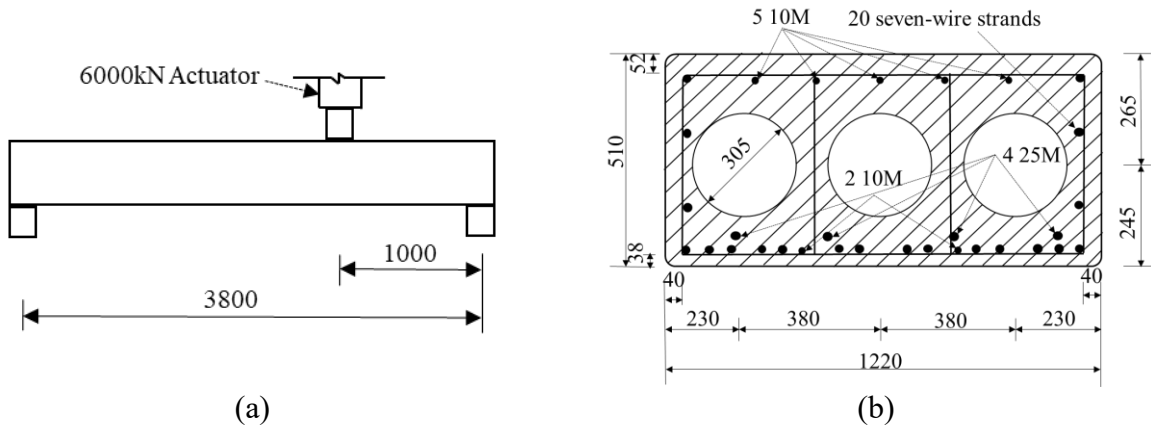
Tested PC girder: (a) test setup, and (b) cross-section (units: mm)
